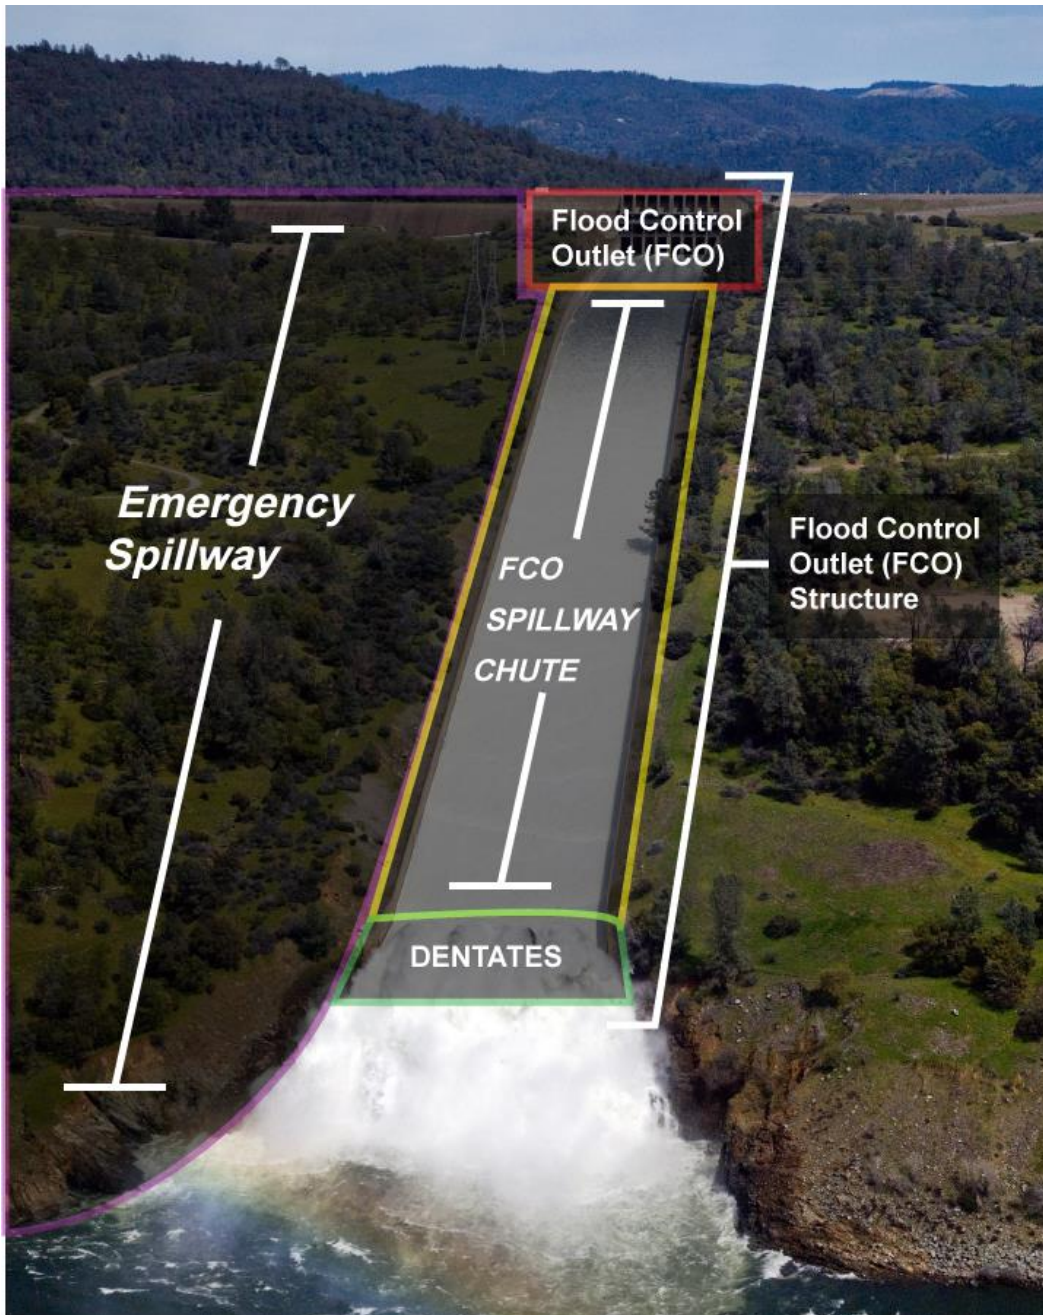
Flood Control Outlet (FCO) Structure and Emergency Spillway, March 2011
